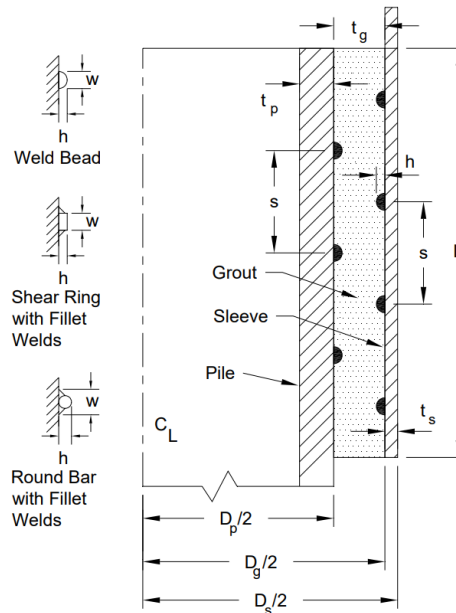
Steel Shell Pile to Steel Sleeve Connections Detail (Gebman, 2016).
